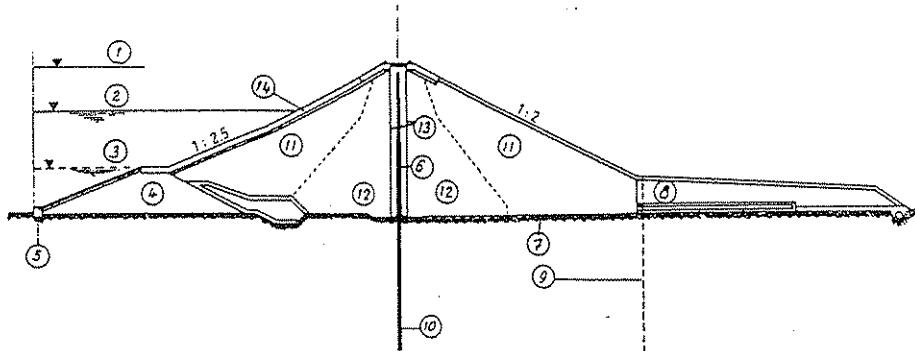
Eberlaste earth dam. Typical section (adapted from Kropatschek & Rienössl 1970).
